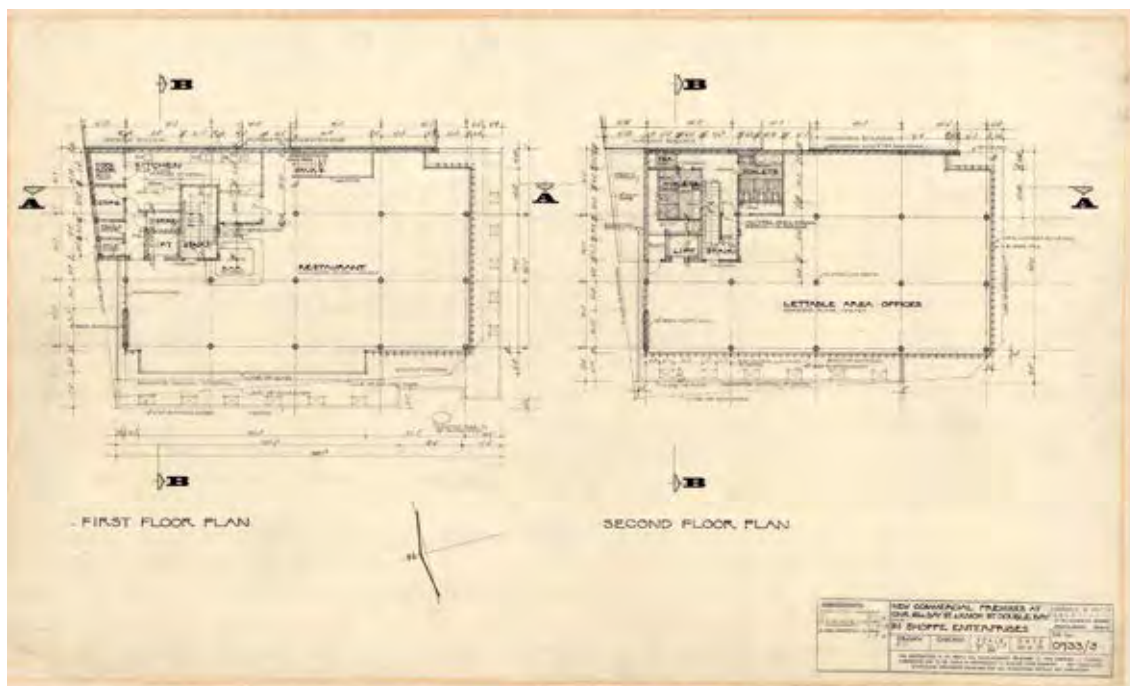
| First and second floor plans of the Gergely & Pinter revisions. The service areas are very differently laid out from the Gruzman plans. The structural system was changed from a slender structure to a conventional concrete column and slab frame. The coffered ceilings were deleted. (Source: Gergely & Pinter)
